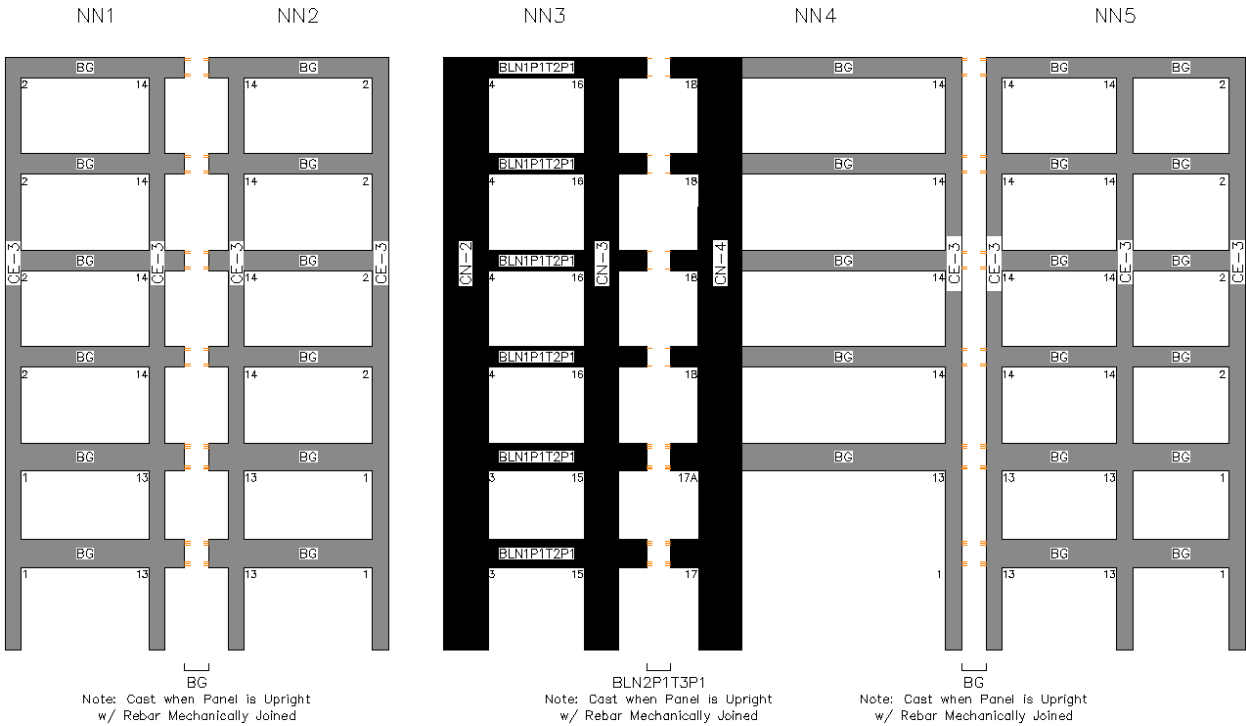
, Joint Locations and Respective North Tilt-Up Wall Panels Designations
